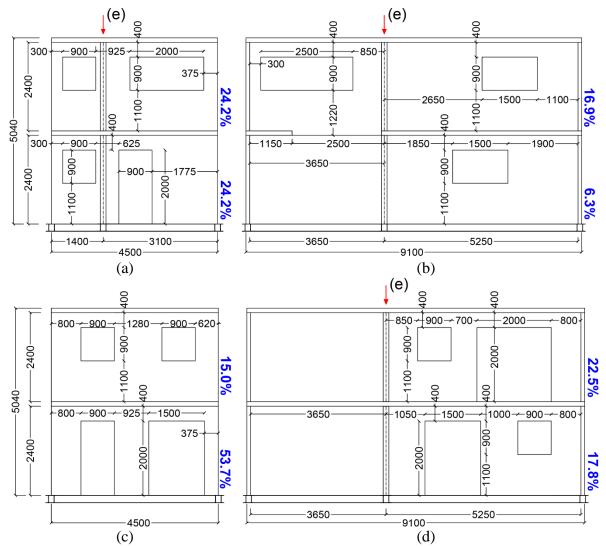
Building facades (dimensions in mm): (a) façade A-A'; (b) façade C-C'; (c) façade B-B'; (d) façade D-D'; (e) spline joint. (note that the plotted percentage values concern the relative area of the openings within each façade).
